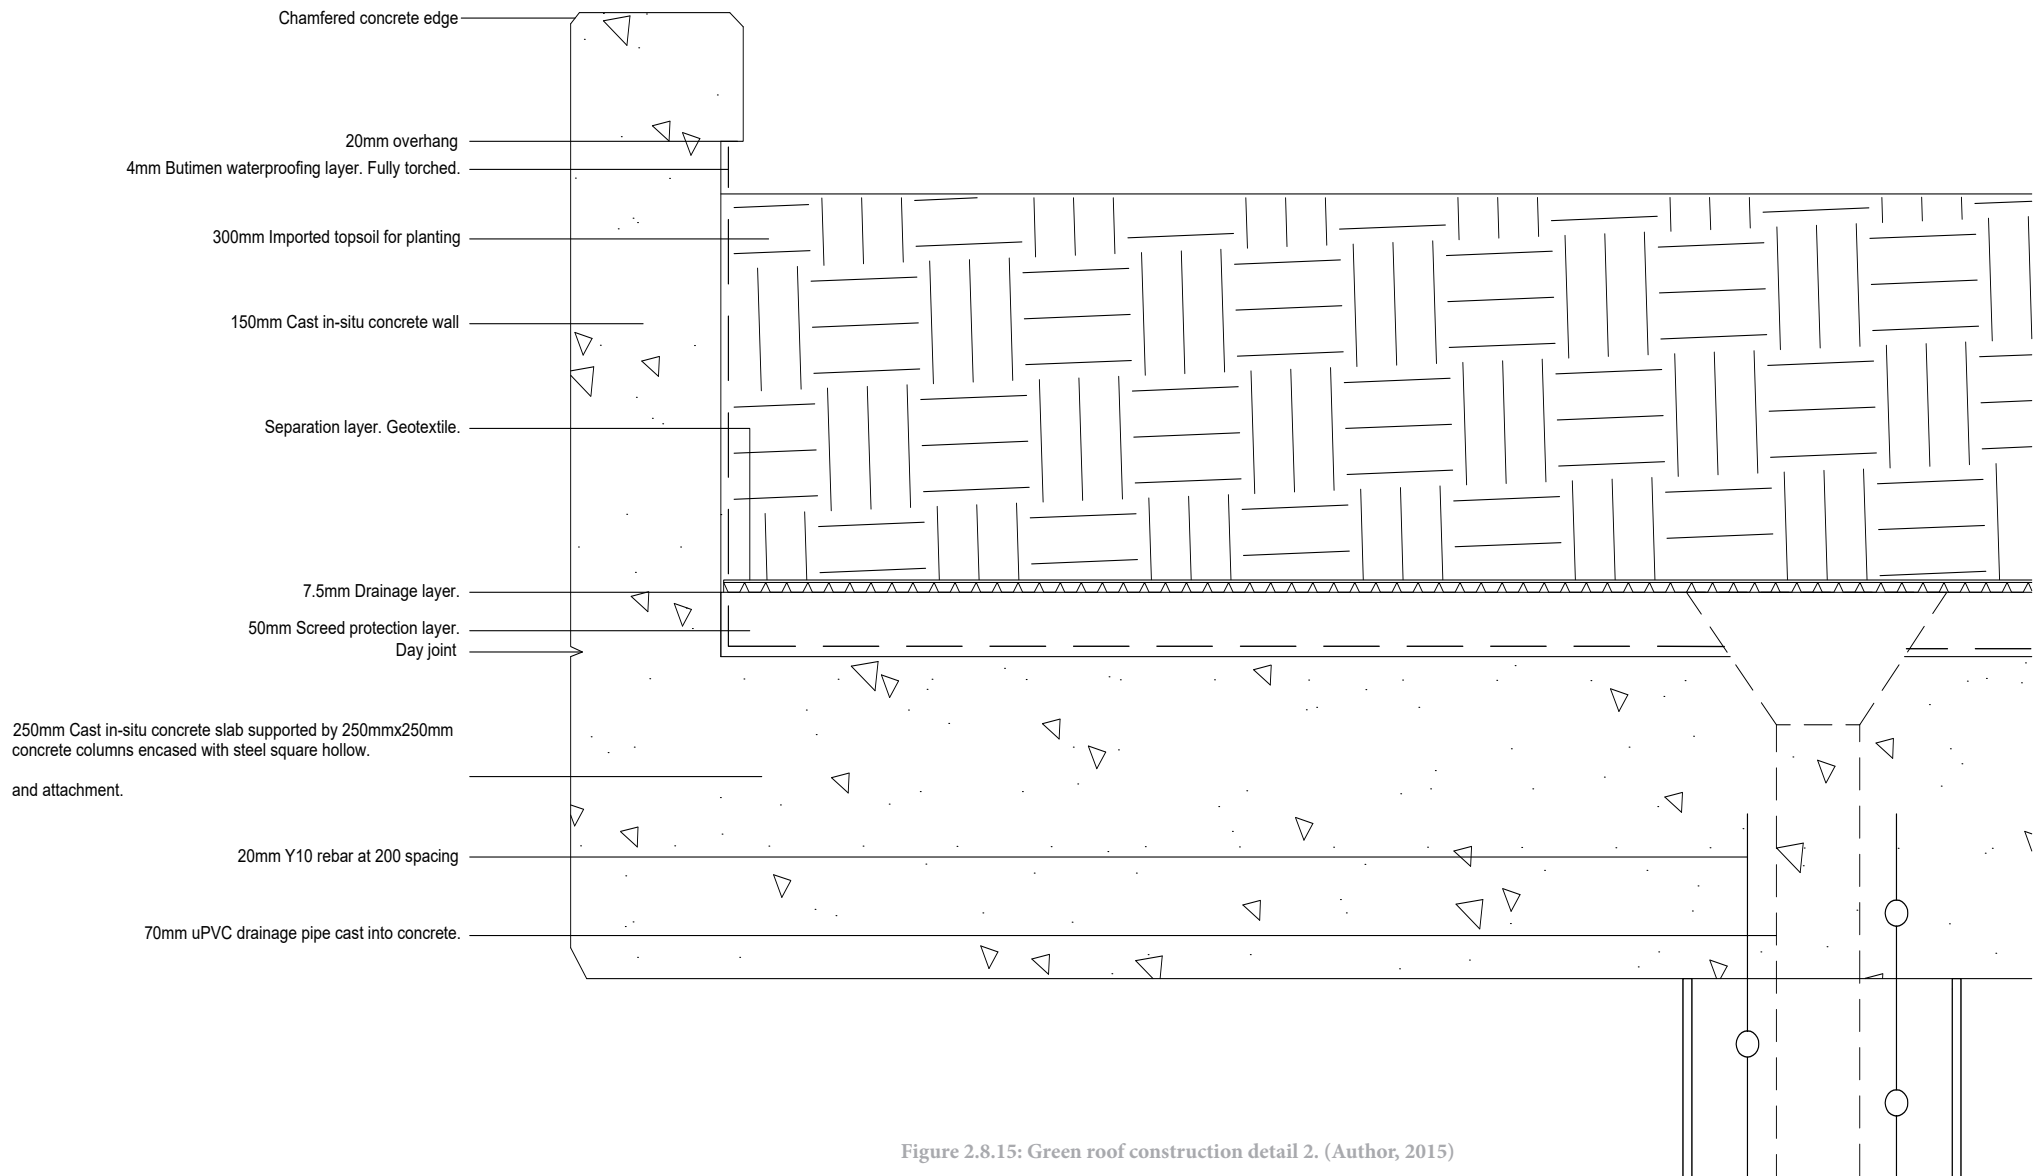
Green roof construction detail 2. (Author, 2015)
